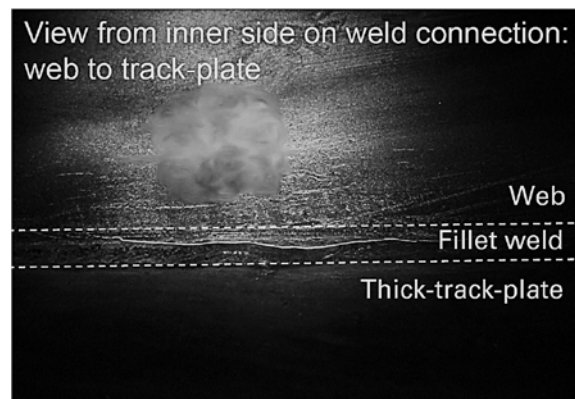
Crack arising at inner side longitudinal weld of trough tests.
